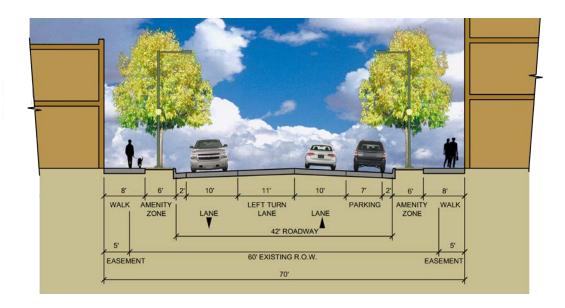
Option 1 for Permanent Main Street Road Diet. The curbs are relocated in order to create a 3-lane section with on-street parking on one side of the street. In this option, there is a 42-foot wide roadway. Easements would be required in order to fit the full 8-foot sidewalk and 6-foot amenity zone.
